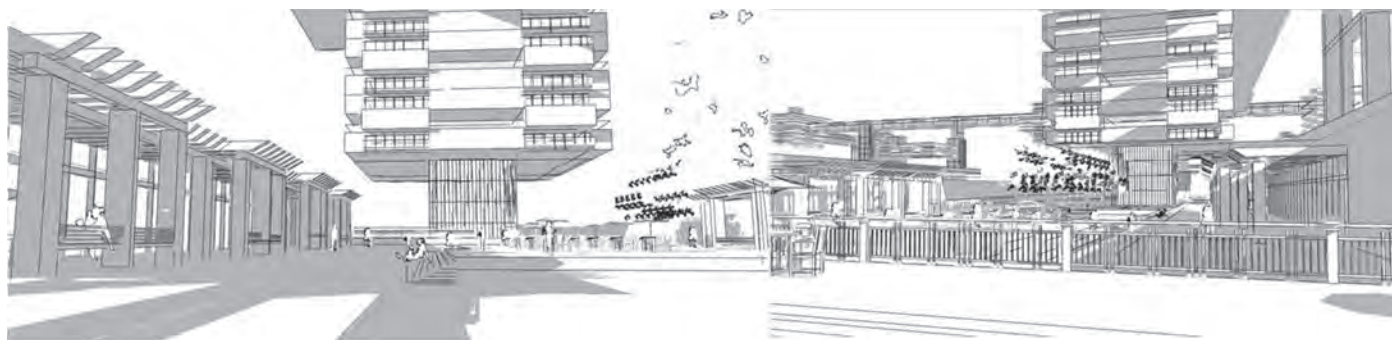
Perspective of neighborhood units' secondary ground. It could be divided into grass, hard pave, wood deck, combining with construction and small buildings. Source: YangXu, Huang Yiru.
